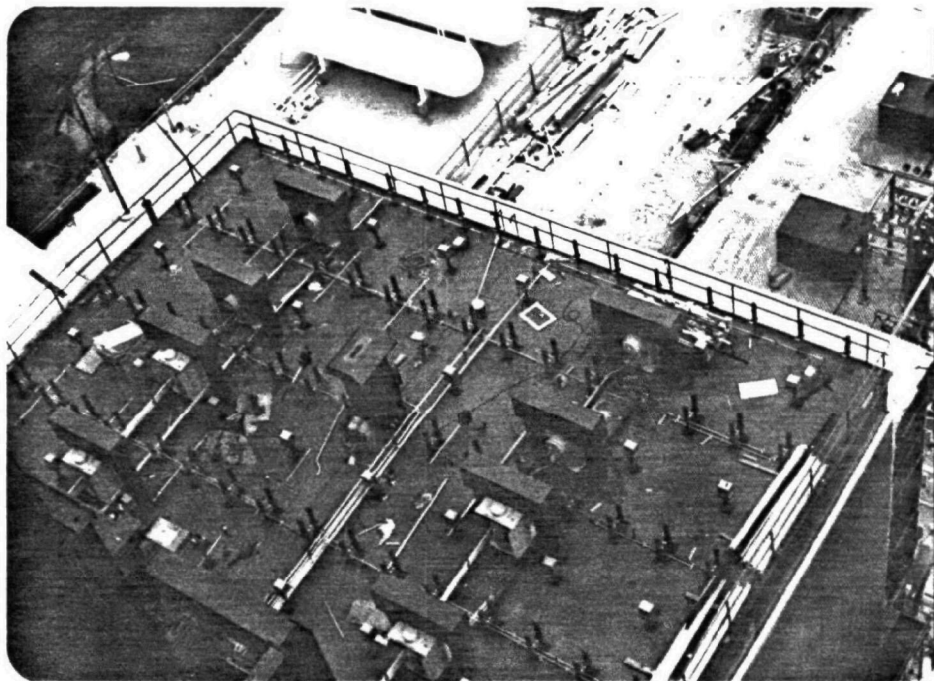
View from the boiler house roof facing south showing the top of the ESP for Boiler 8.
